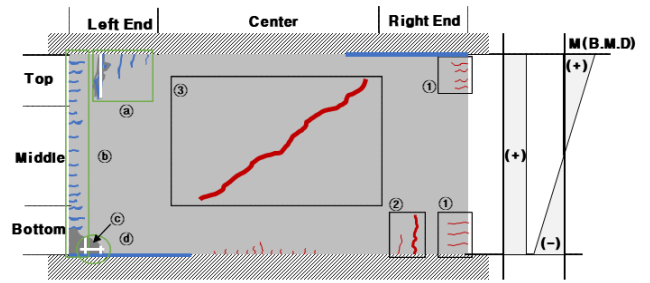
Crack and Damage Type of Reinforced Concrete Vertical Members
